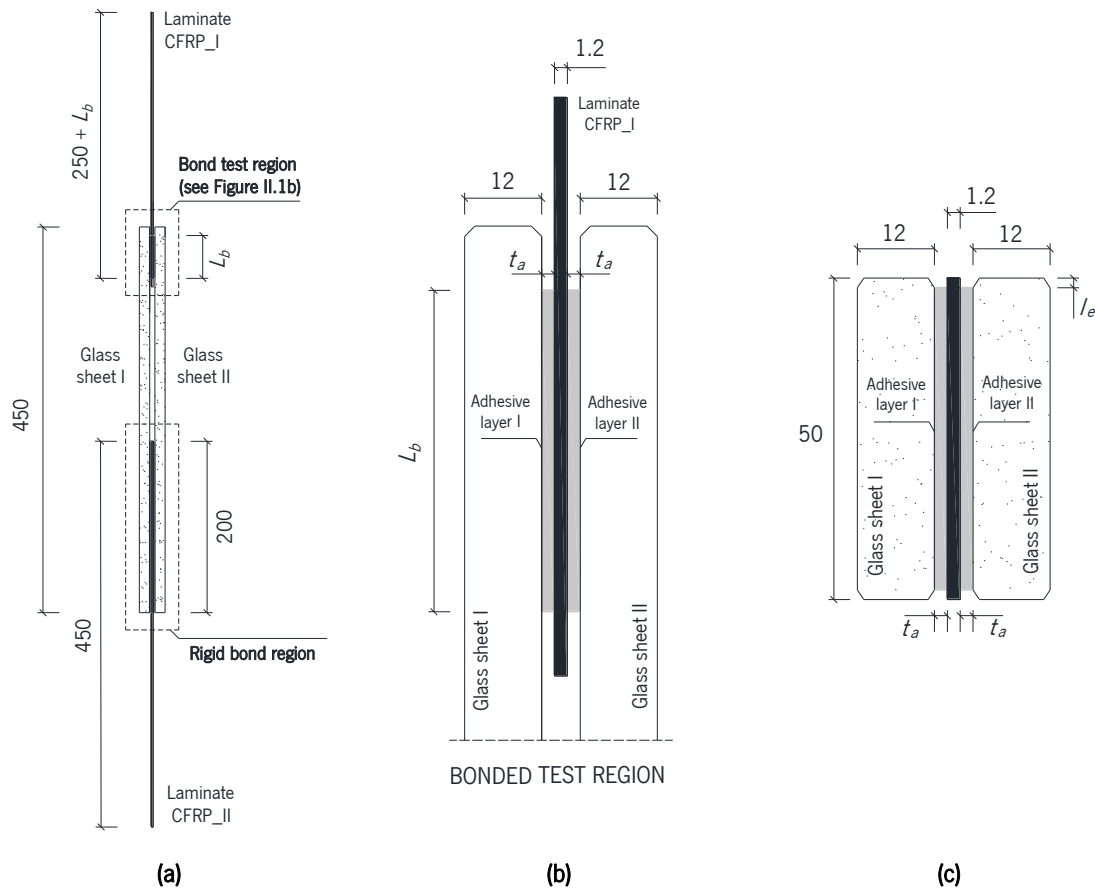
Double-lap joint tests: (a) specimen's geometry, (b) studied connection and (c) connection cross-section. Units in [mm].
